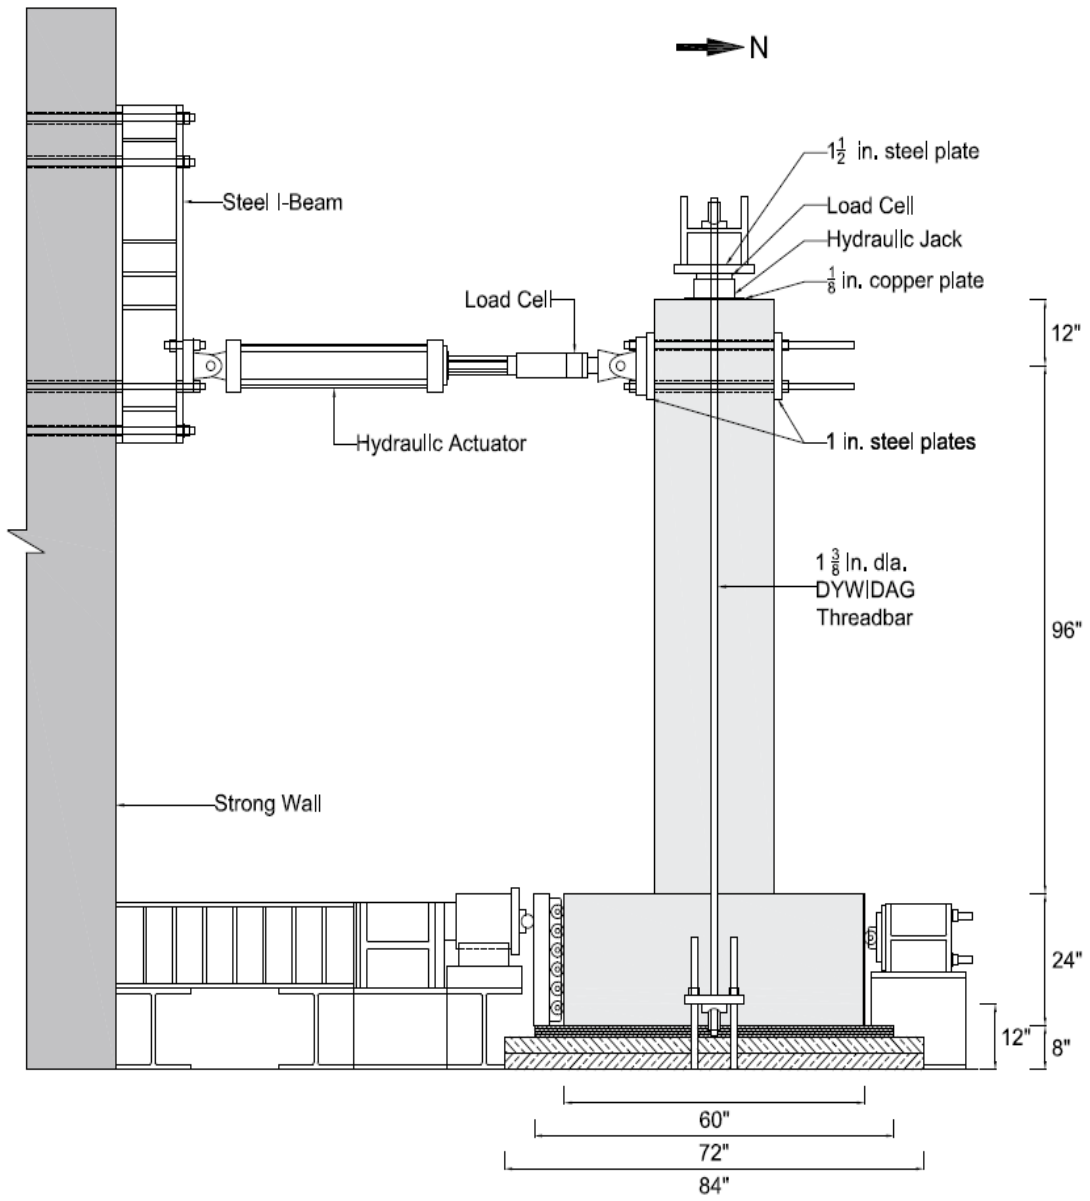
Typical lateral loading setup (East elevation, short specimen shown)
